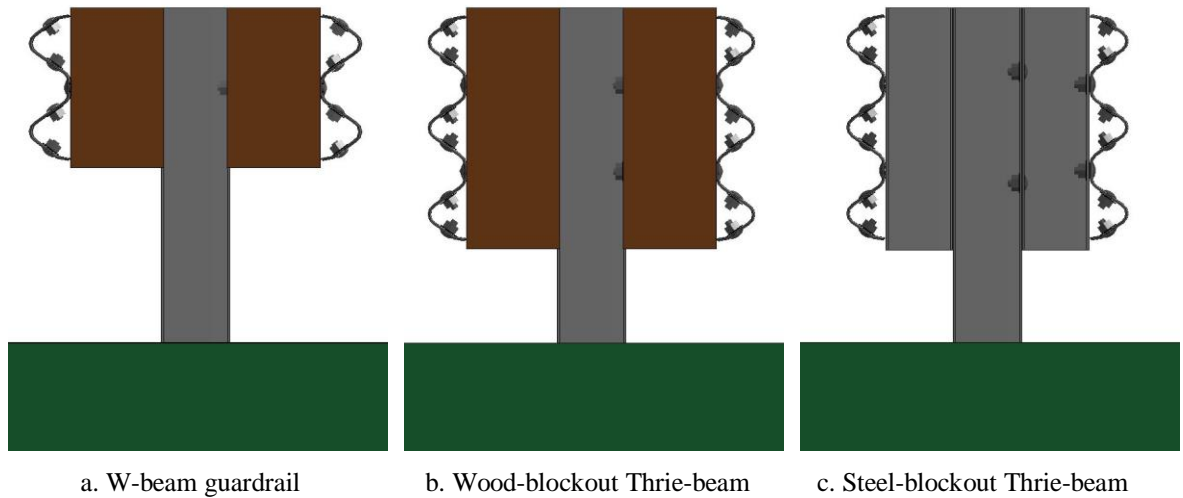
Profile views of the 29-inch double-faced guardrail FE models.
